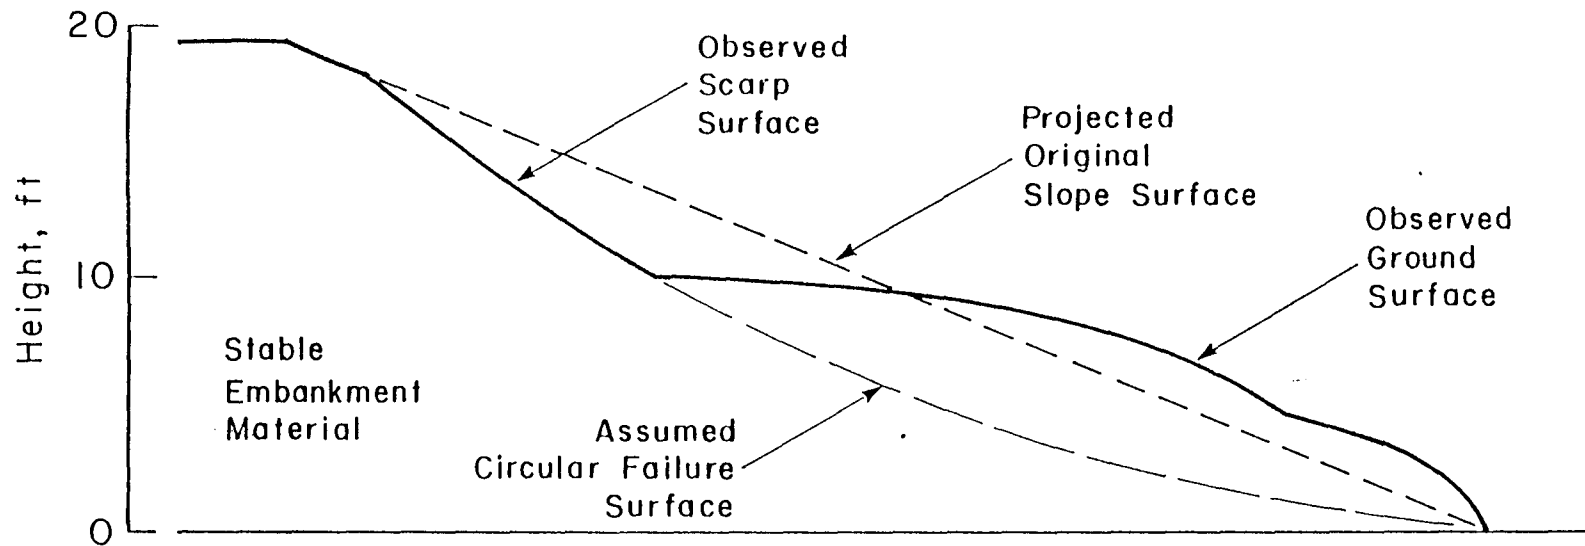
Cross-section of Embankment Slide at Ill 610 and Scott Street
